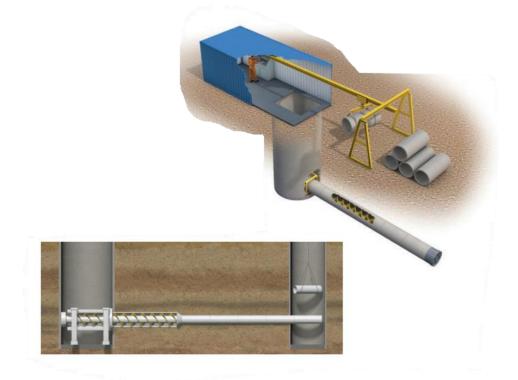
Typical Pipe Jacking Arrangement (Source: Pipe Jack Association)
